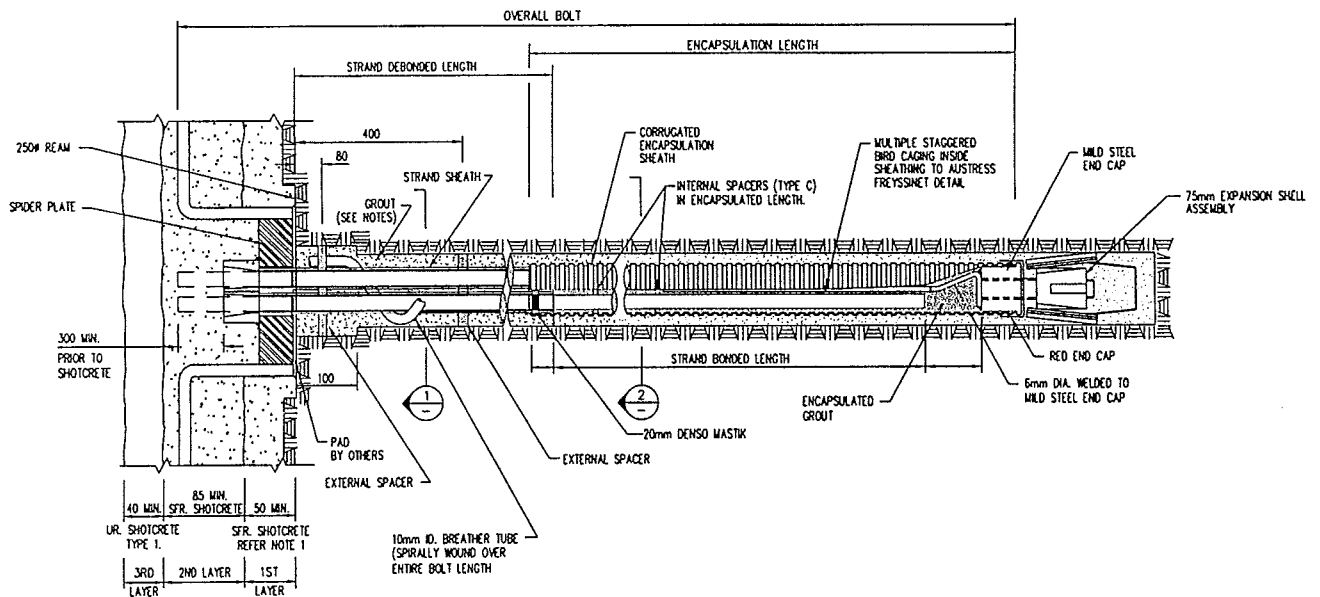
Twin strand bolt (Austress-Freyssinet).
